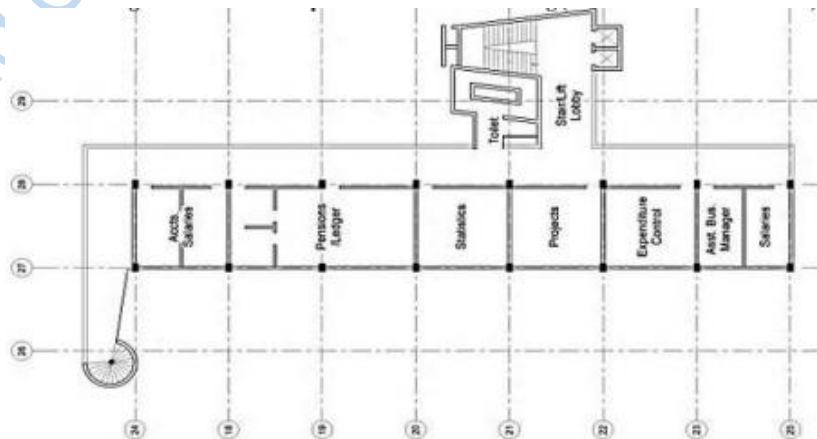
First floor plan of OAU Senate Building (Source Author's Field work)
